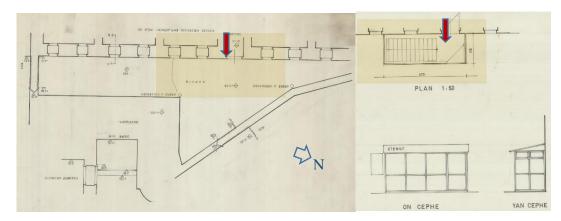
Plan and section drawings for wc space and door additions in 1960's (archive of DGF)
